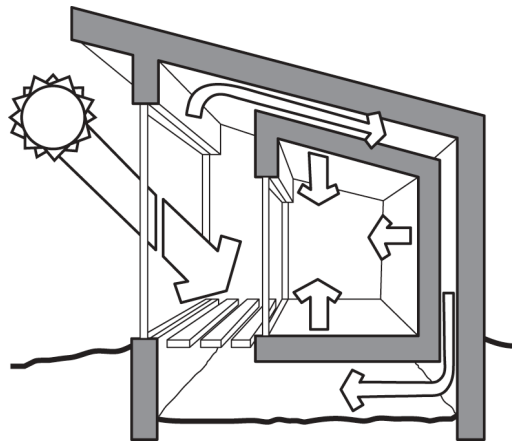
Thermal envelope house construction (Source: Chen, 1983).
